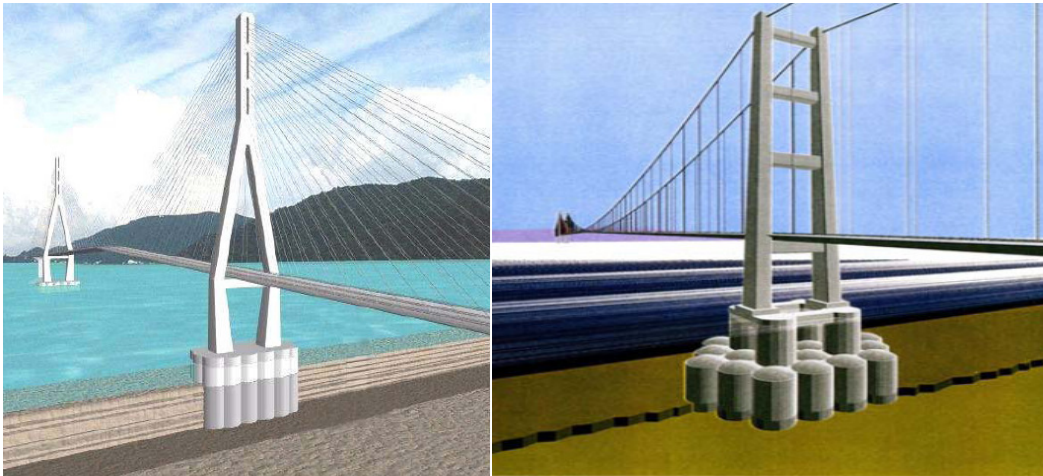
d. Application of skirt suction foundation to bridge substructure
